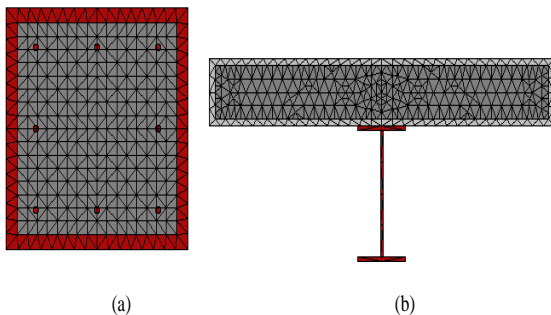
Fiberized section views for (a) CFST columns and (b) composite beam.
